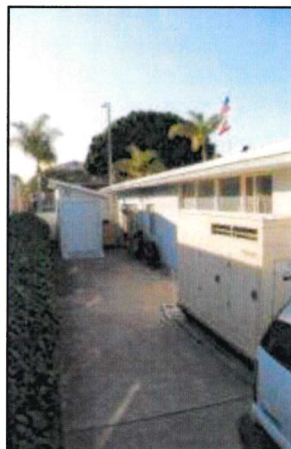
Fire Station #1 Concrete sidewalk exhibits deterioration through scaling and spalling.
